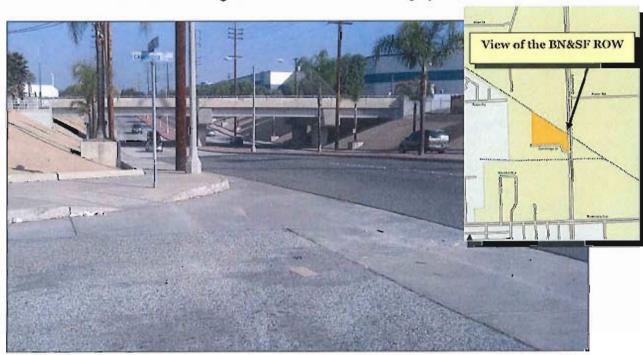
PHOTOGRAPHS OF THE PROJECT SITE
